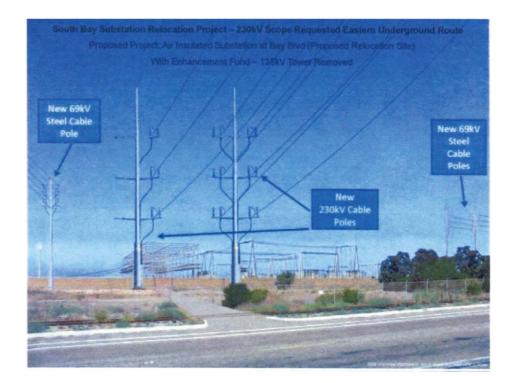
SDG&E Visual Simulation of Bay Boulevard Substation with Three Cables per Phase Undergrounded Beginning 300 ft. East of Substation Site
